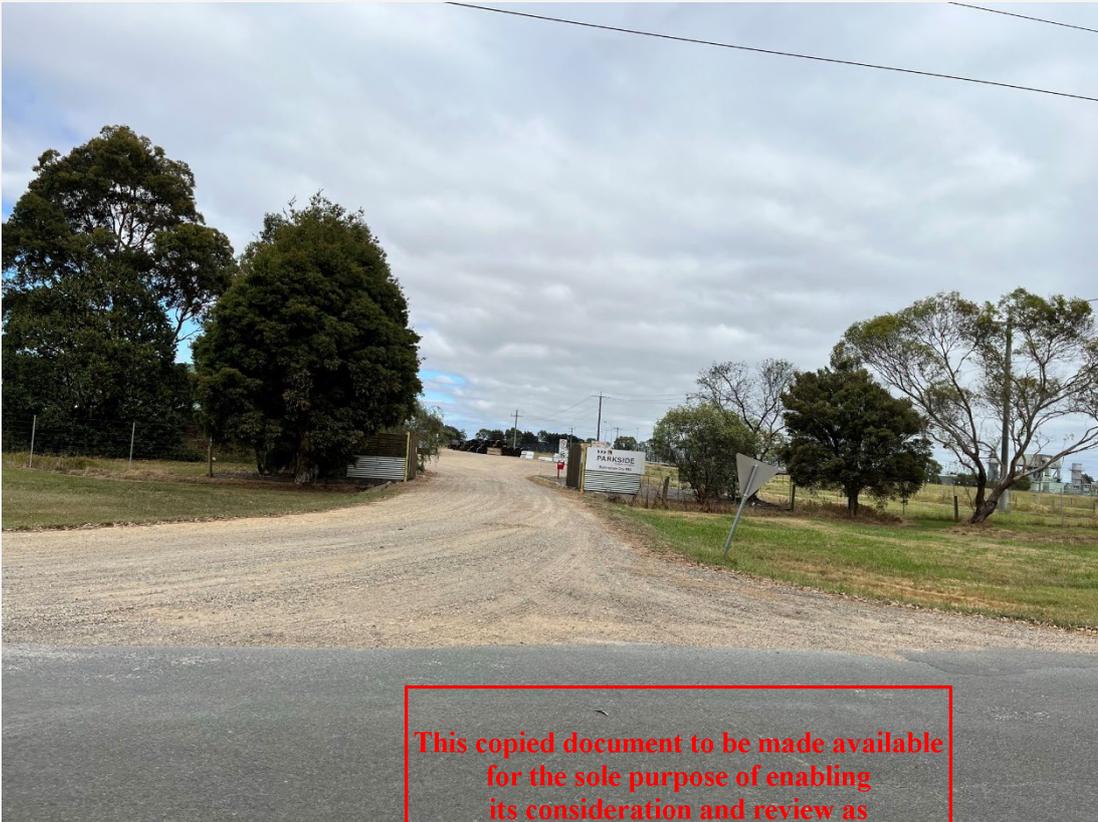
| View of northern entry to 15 Power Station Road, viewed from Power Station Road, looking west
